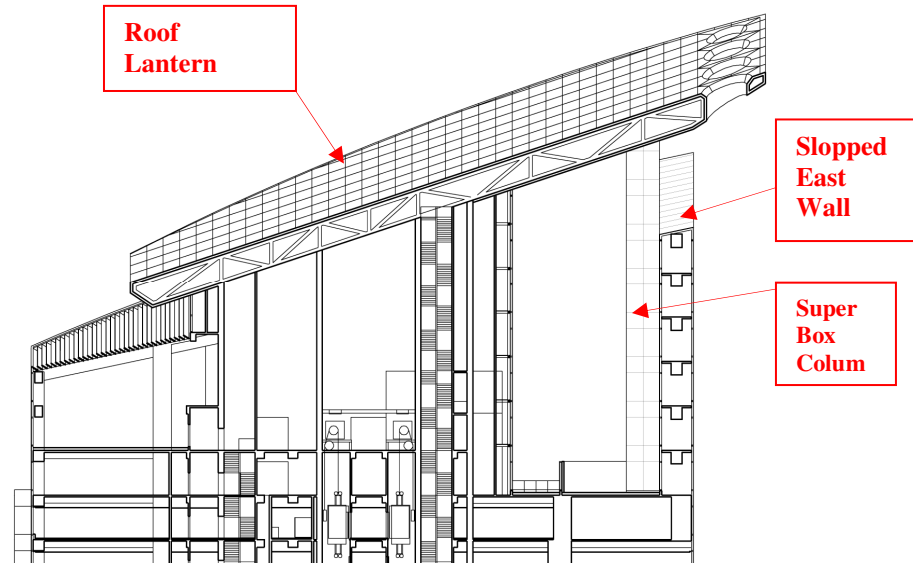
ROOF LANTERN AND EAST WALL ELEVATIONS
